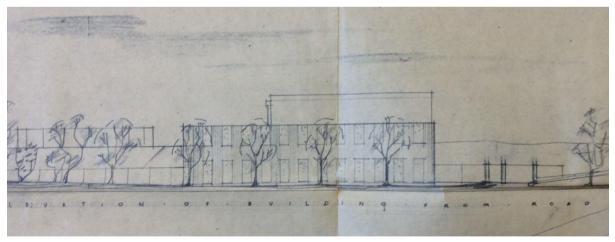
Kirknewton northwest elevation as drawn by MPBW 1963 (NRS)
